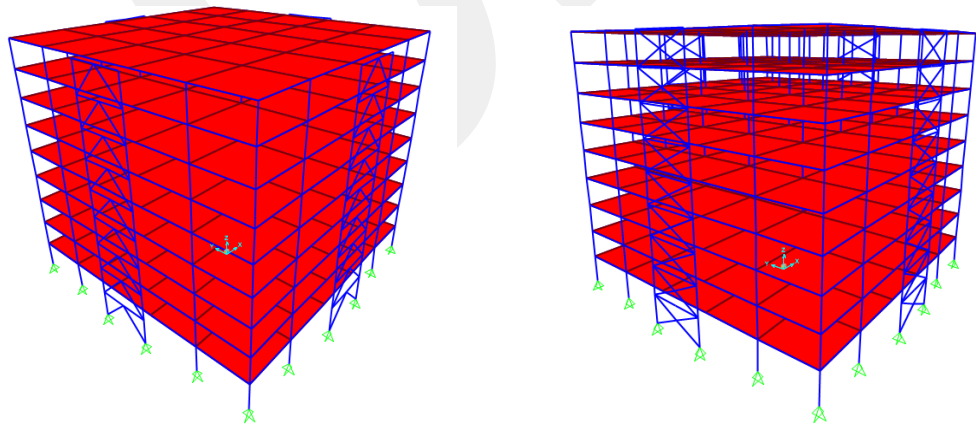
9-Story Strengthened Building Model with Inverted V- and X-Type External Steel Braces
